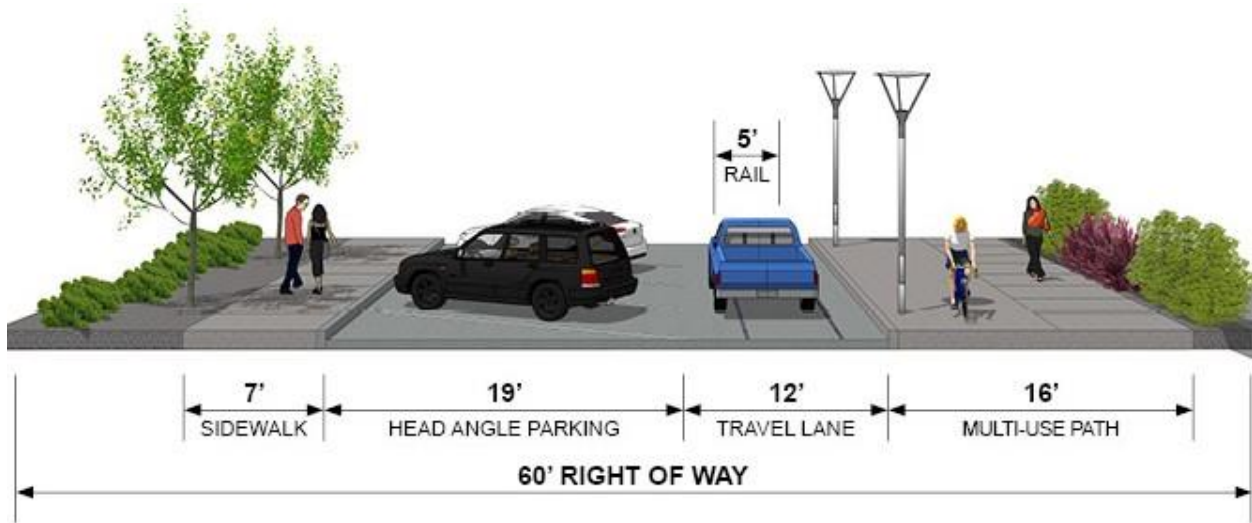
Alternative 2 - Proposed Section E (Market Avenue to Alder Avenue)
